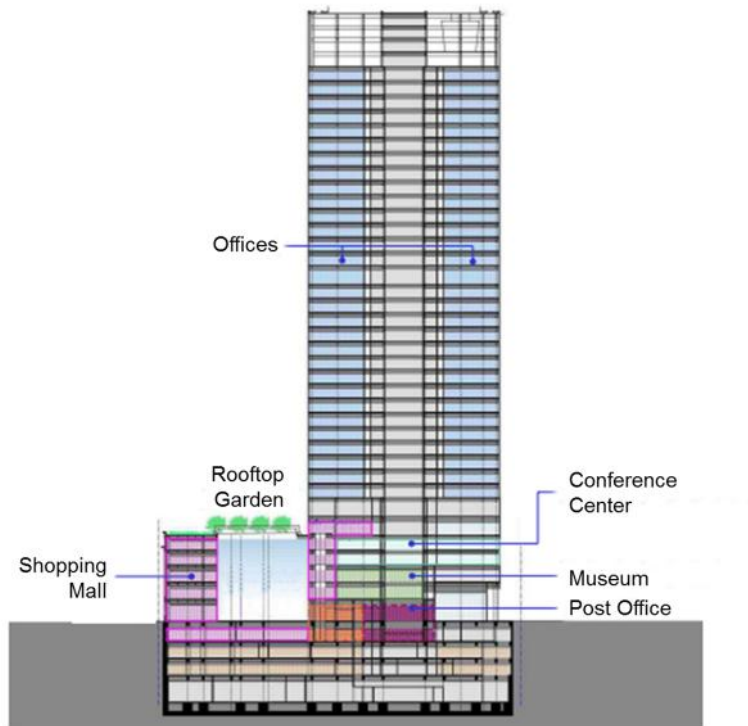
Cross-section of JP Tower. ¹⁴⁷
